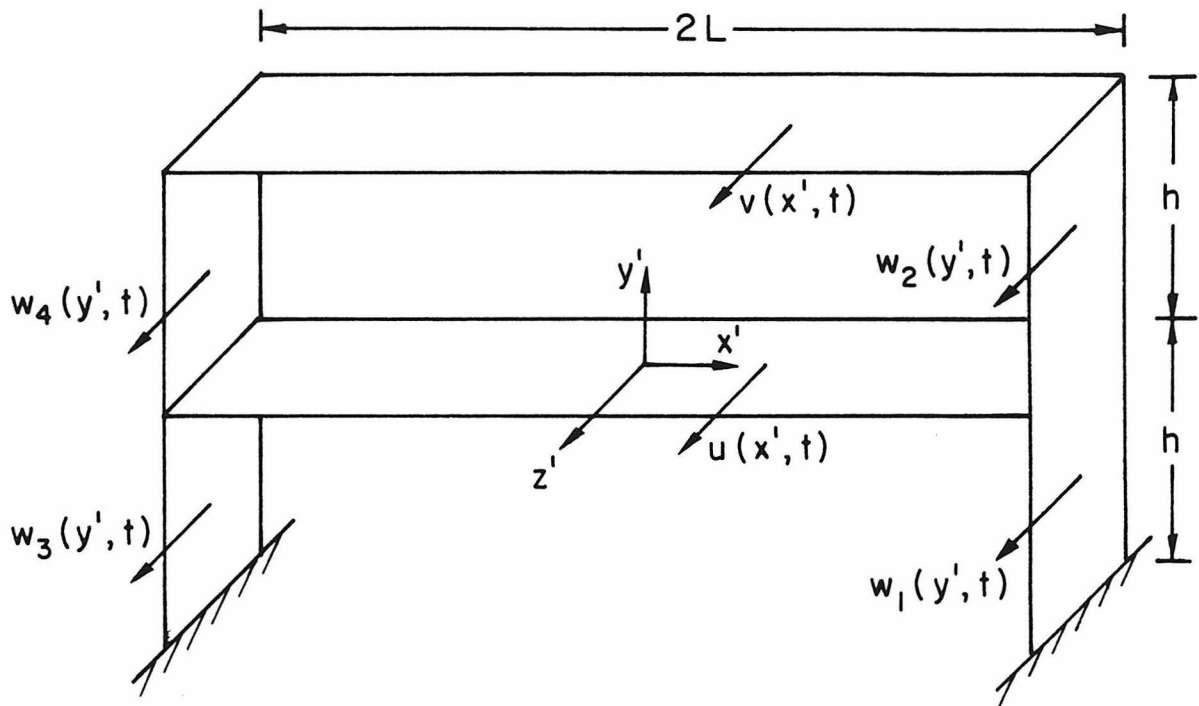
MODEL OF A TWO-STORY BUILDING WITH TWO END WALLS.
